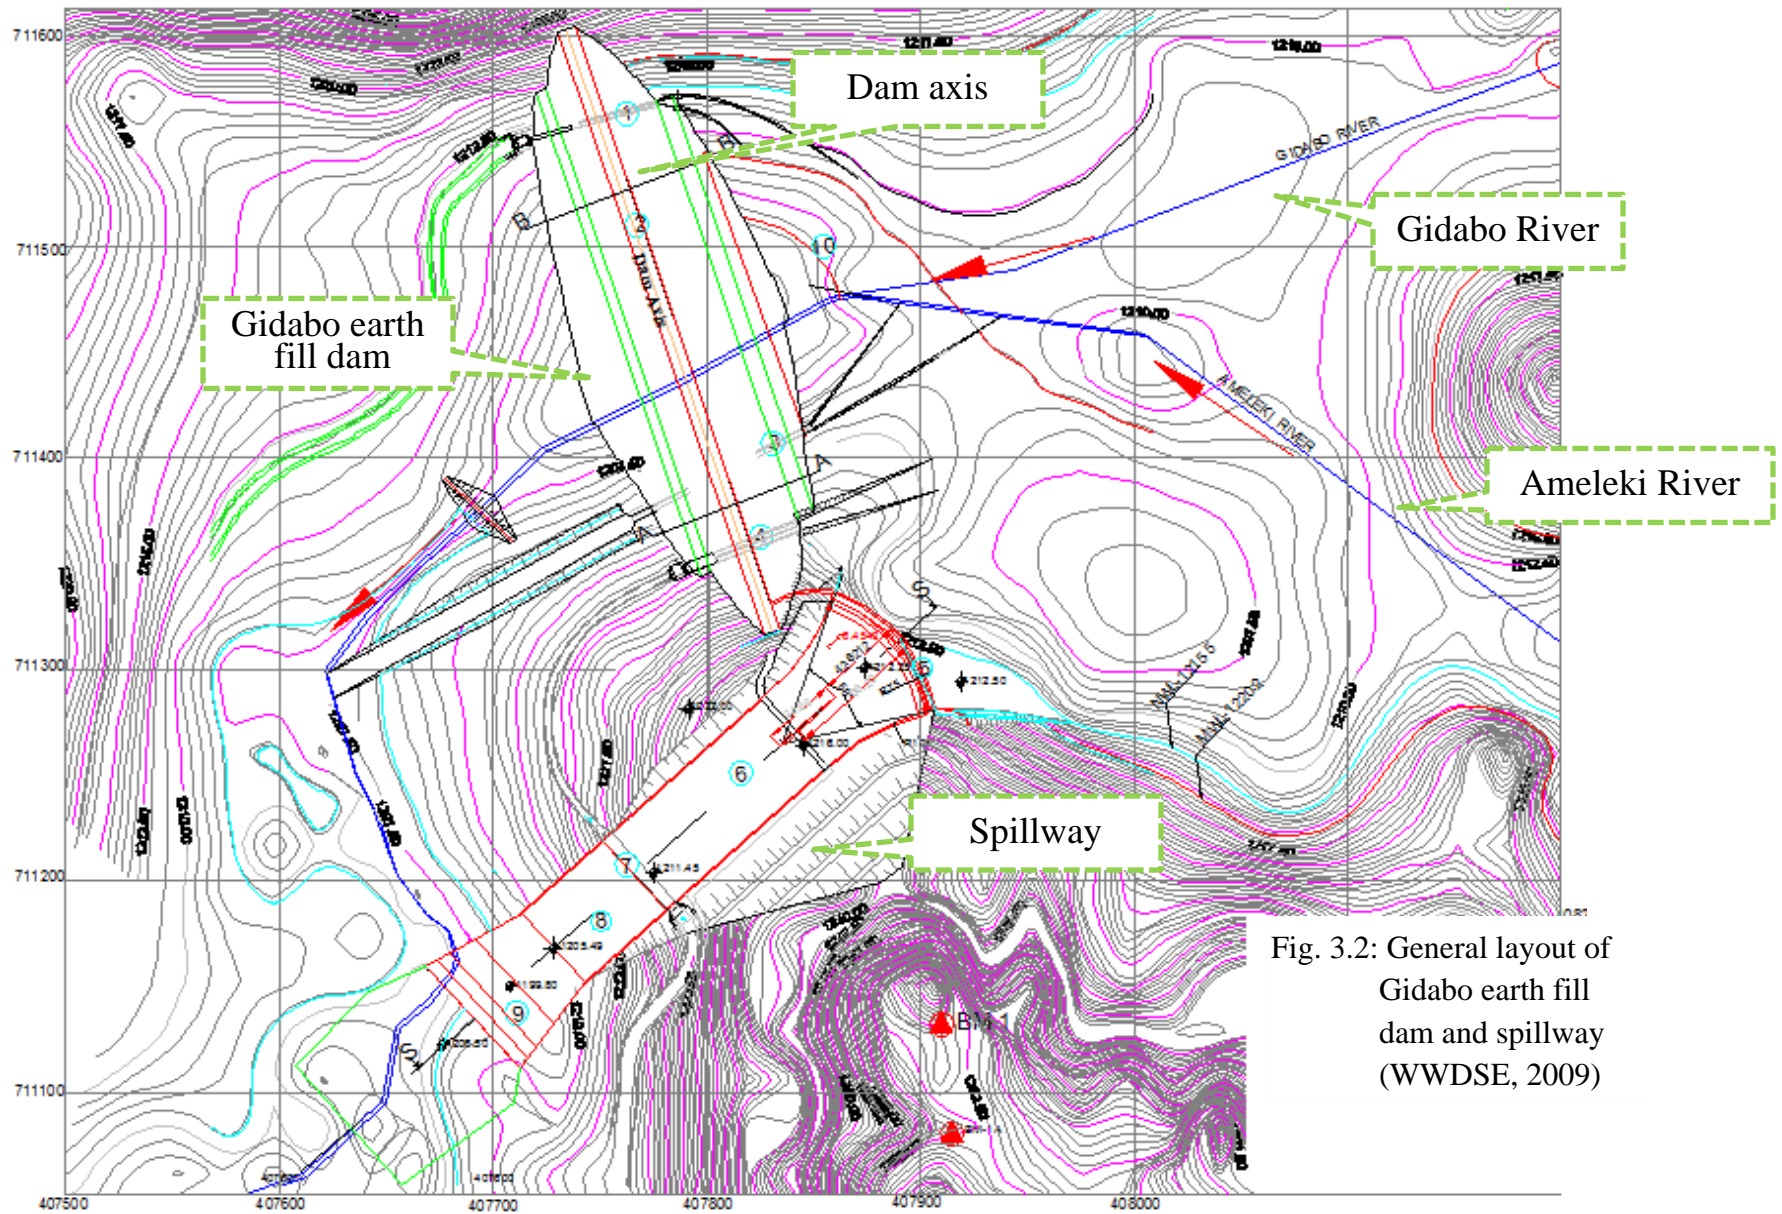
General layout of Gidabo earth fill dam and spillway (WWDSE, 2009)
